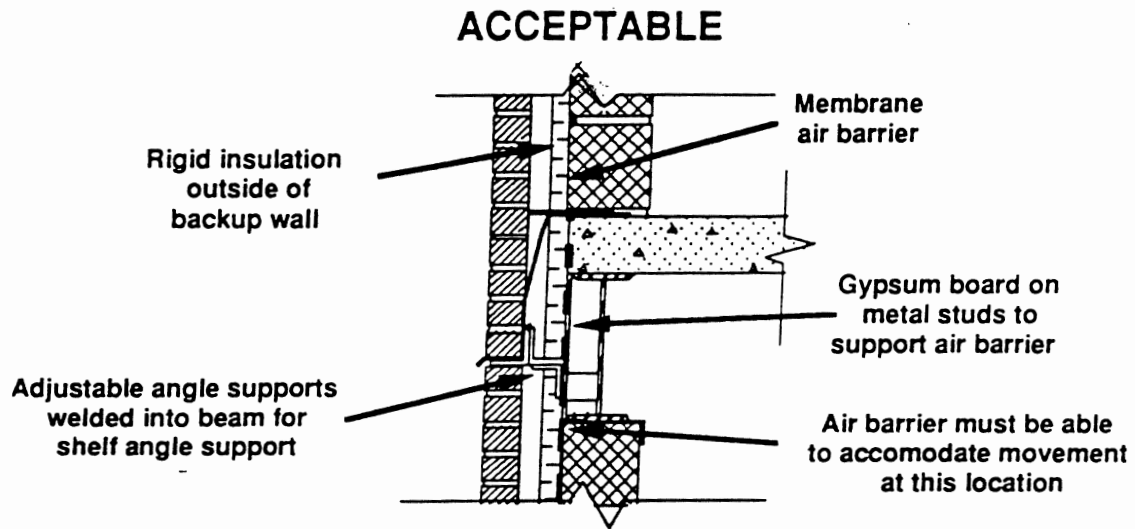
Wall/Floor Connection - Steel Frame (Brand)
